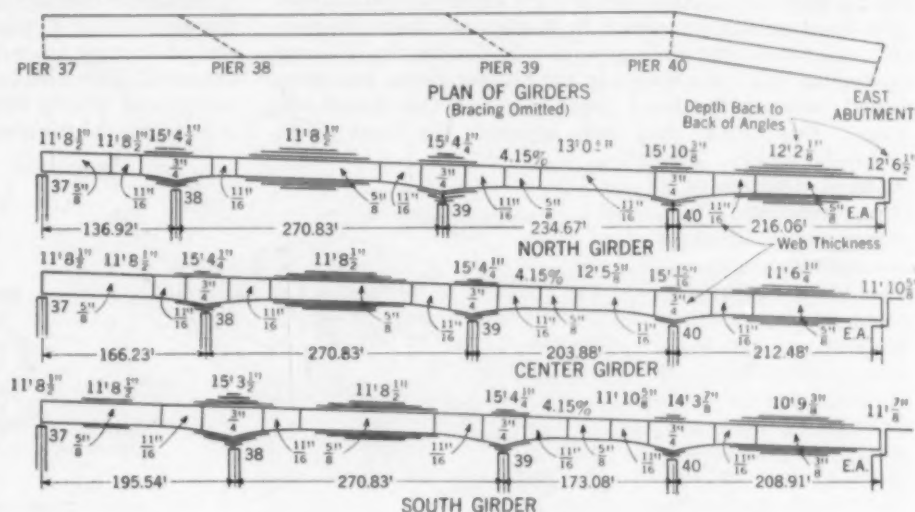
ARRANGEMENT OF GIRDERS, LAKEFRONT RAMP OF MAIN AVENUE BRIDGE, CLEVELAND, OHIO
